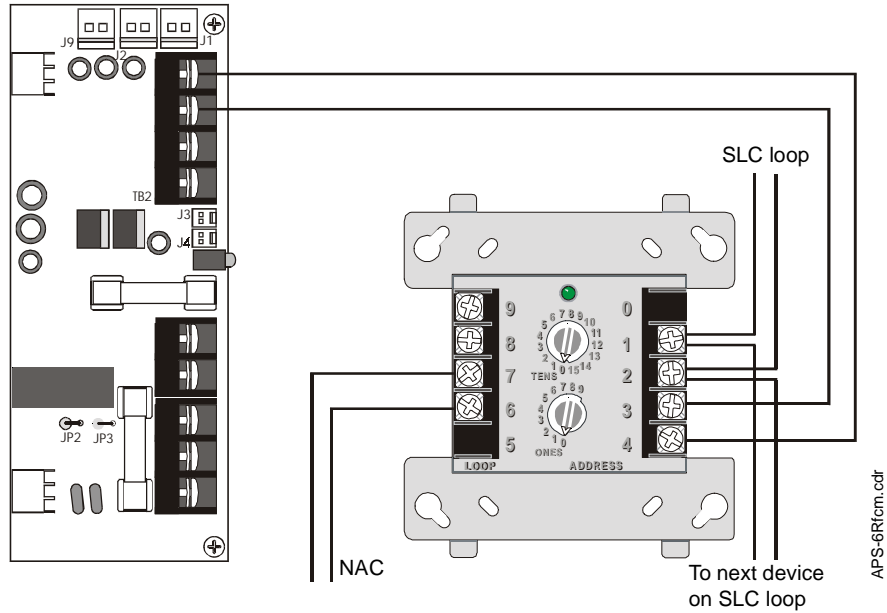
Typical ADT-APS-6R Wiring to a M300CADT Module
